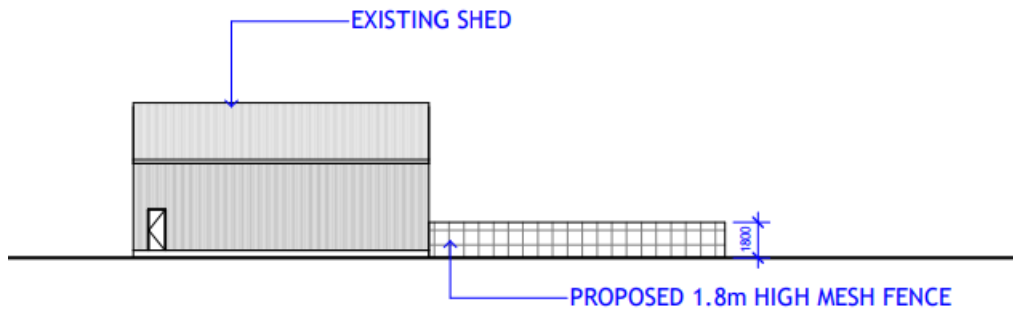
Proposed Elevation Plan showing the 1.8 metre high fence.
